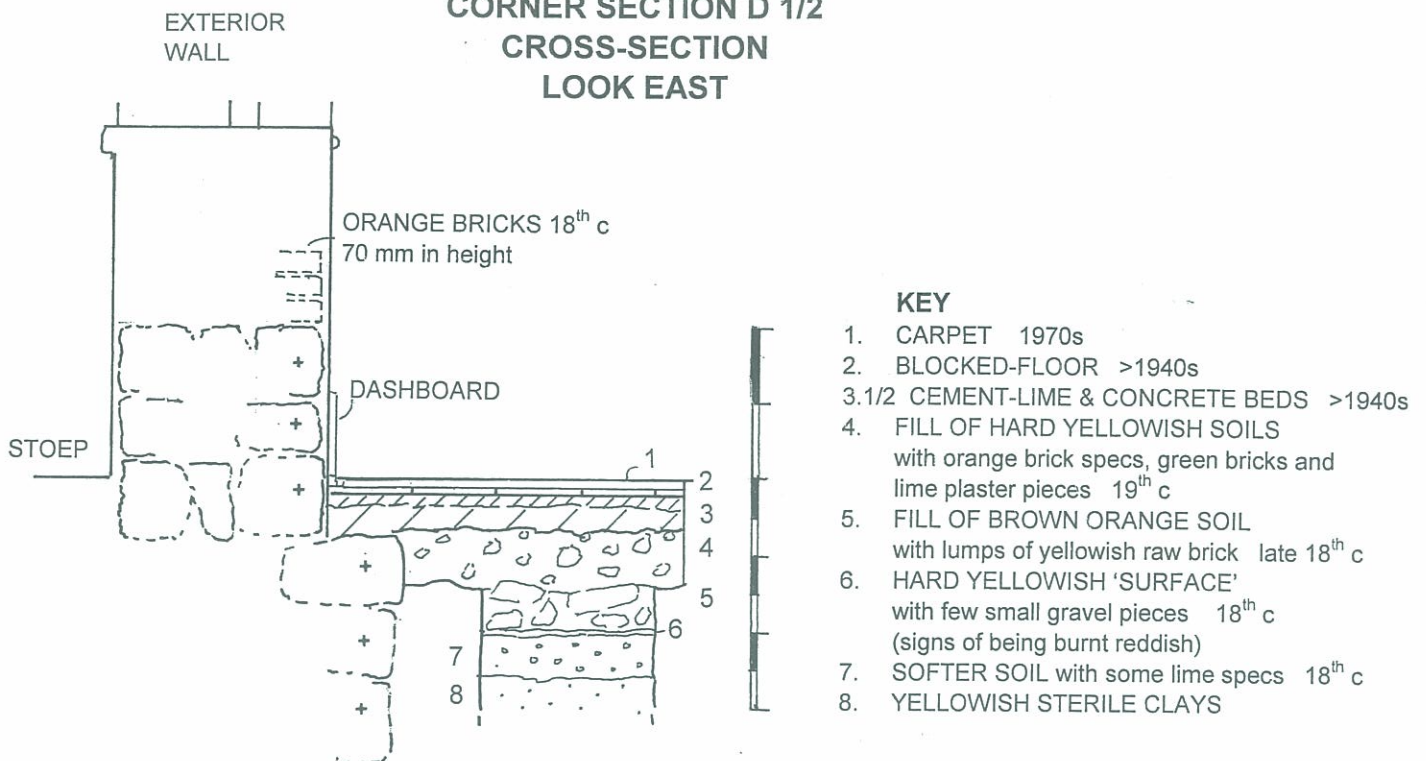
Elevation of the excavation D1/2, containing more earlier fill of raw brick and lime plaster than the other sections.
